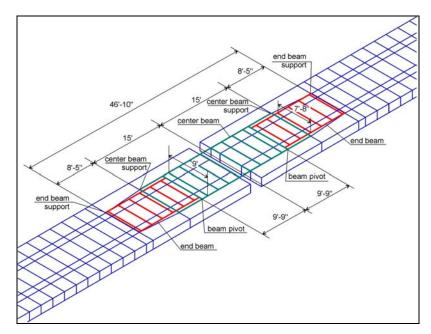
Expansion Joint Model – Three-Beam Transition System – Dimensions in Feet and Inches.
